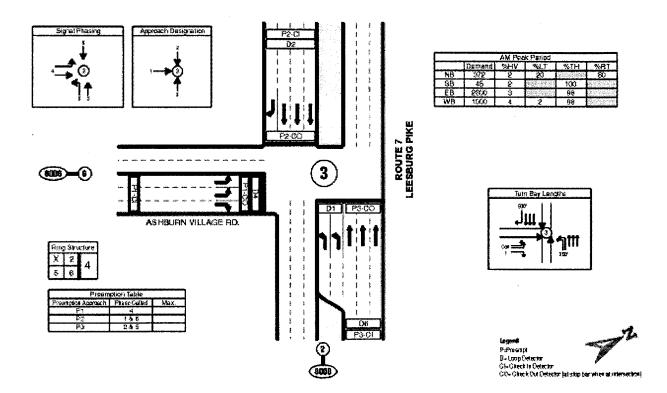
Geometry and intersection layout for Route 7 at Ashburn Village Rd. (Node 3). This is a typical T-intersection with dedicated double left-turn lanes from the minor street.
